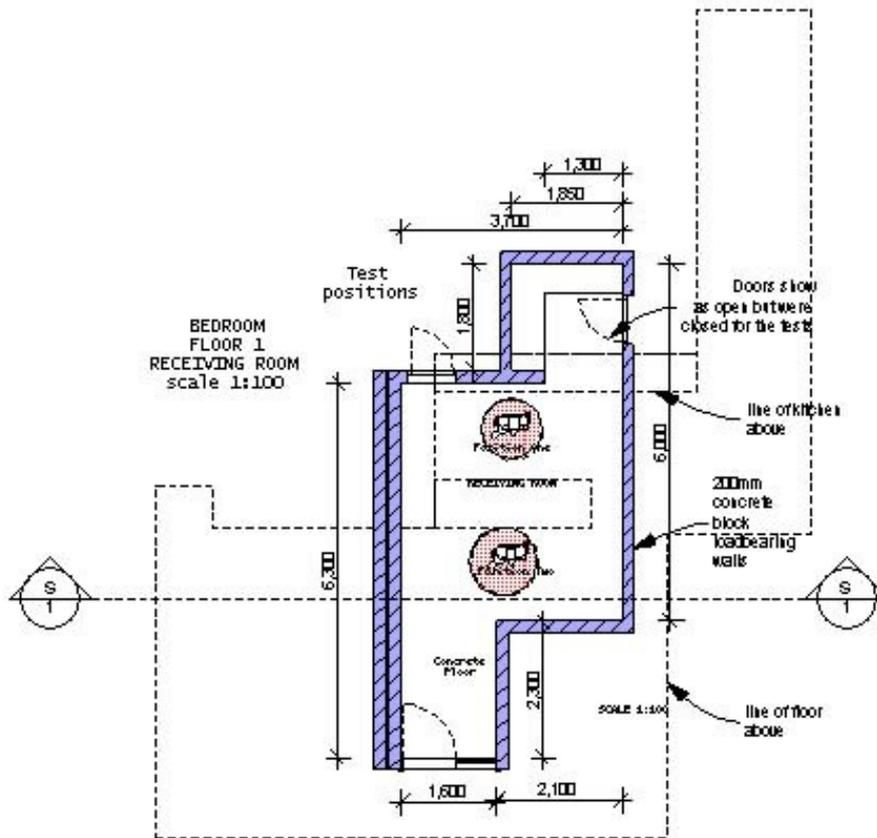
FLOOR PLAN – BEDROOM FIRST FLOOR – RECEIVING ROOM
